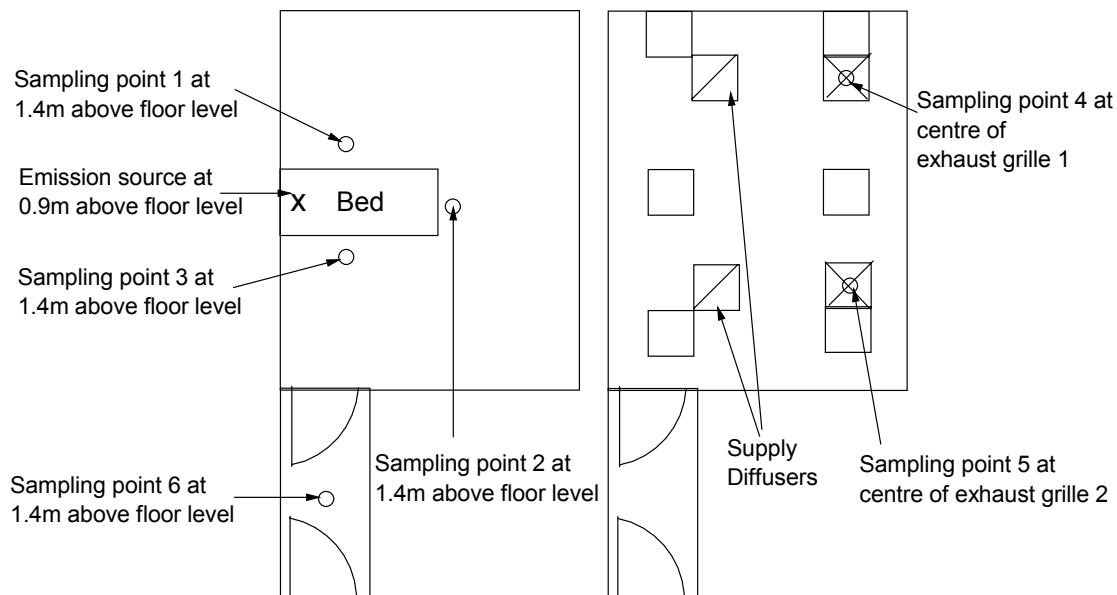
Sampling points in the isolation room (floor and ceiling levels).
